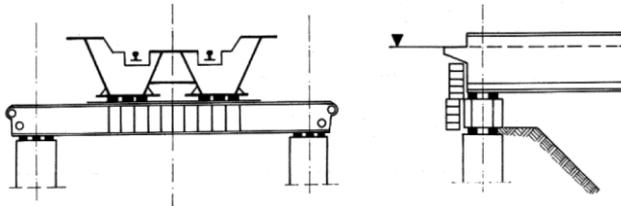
Steel abutment founded on large diameter piles (type KO-Os) ('Central Office', 1997; Miklin & Sawicki, 1993): left - cross-section through the span at the support; right - longitudinal view of a section of the span
